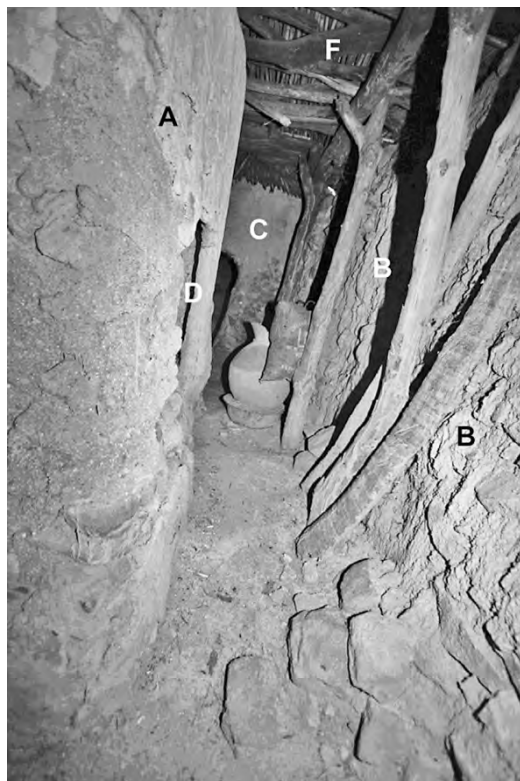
Passageway between front wall of *thala* and outer house wall (second view)
